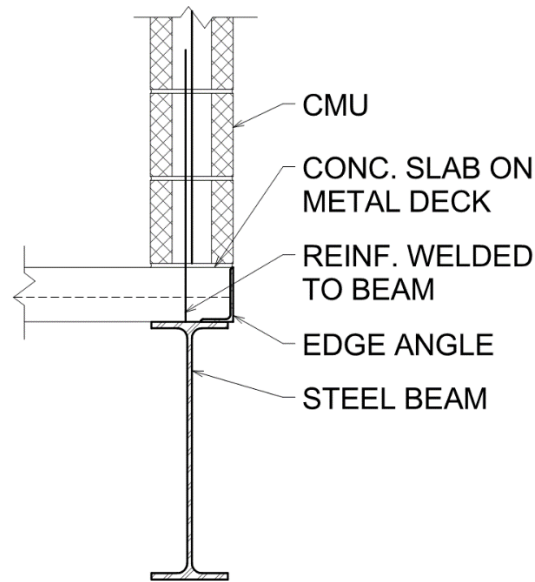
Type I Hybrid Masonry Panel Base Connection
